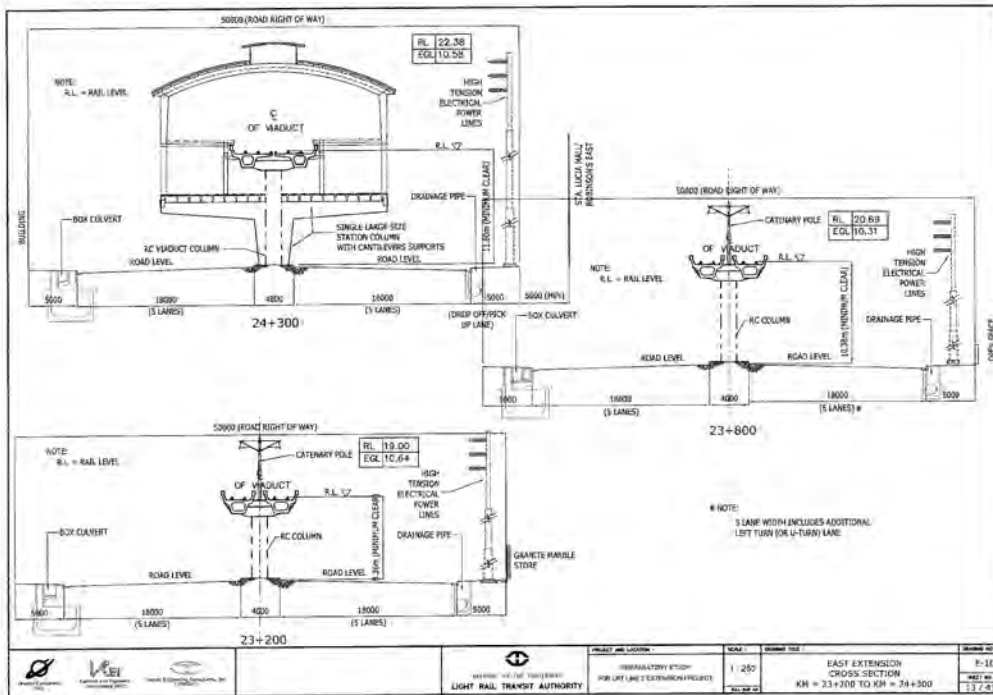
Section drawing of station (Separate platform) and elevated track
